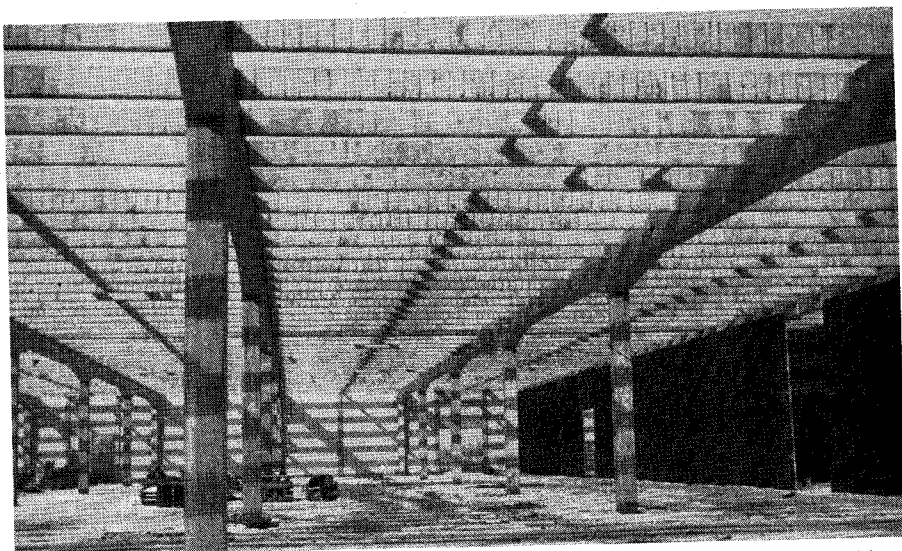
Prestressed block joist on 800,000 sq ft (74,300 m²) warehouse for Wilkins Air Force Depot.
